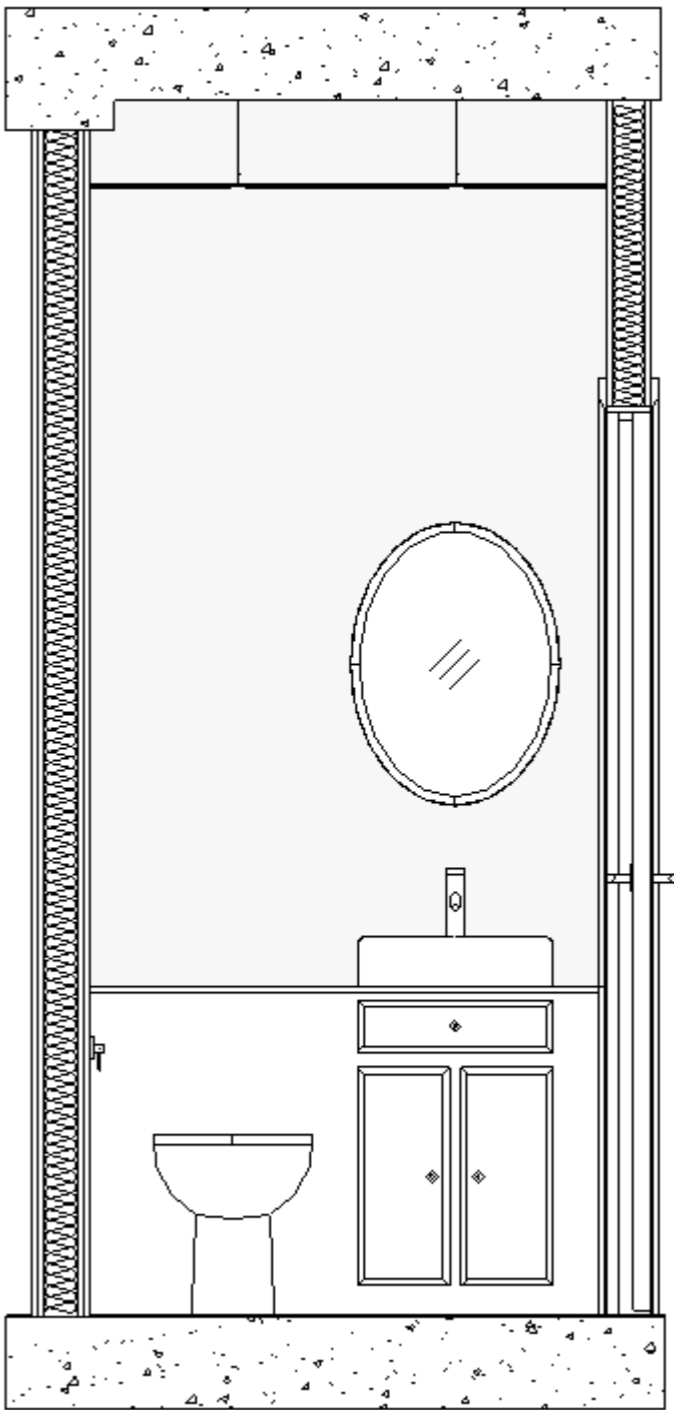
Enlarged Student Bathroom Section (Author, 2021)
